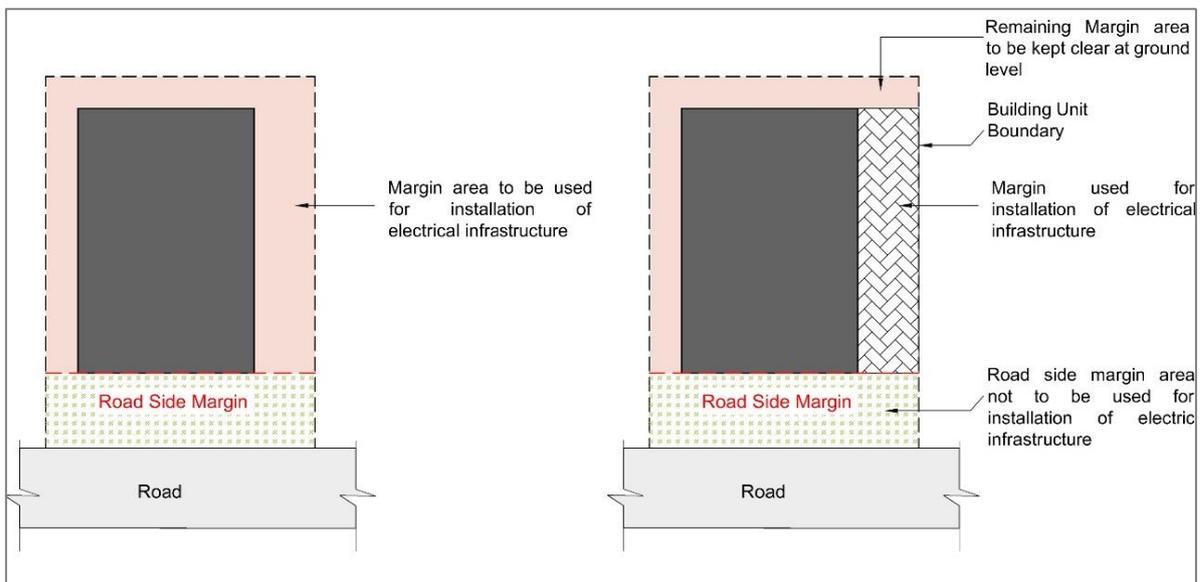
Margin to be Used for Electric Infrastructure
